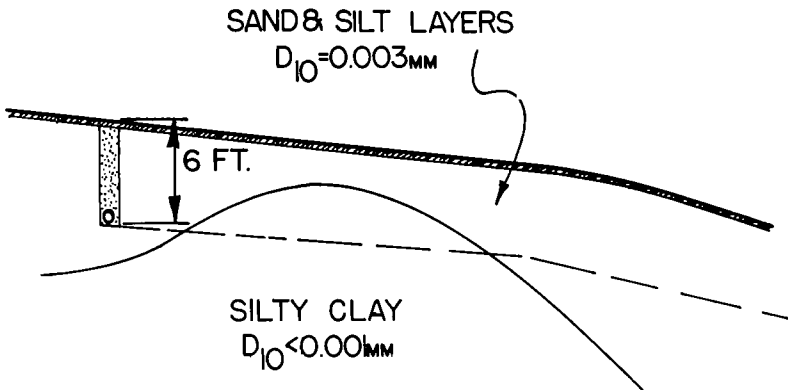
Centerline section at subdrain Site 3 showing the depth of the system of subdrains which completely cut off water from entering the subgrade from any side.
